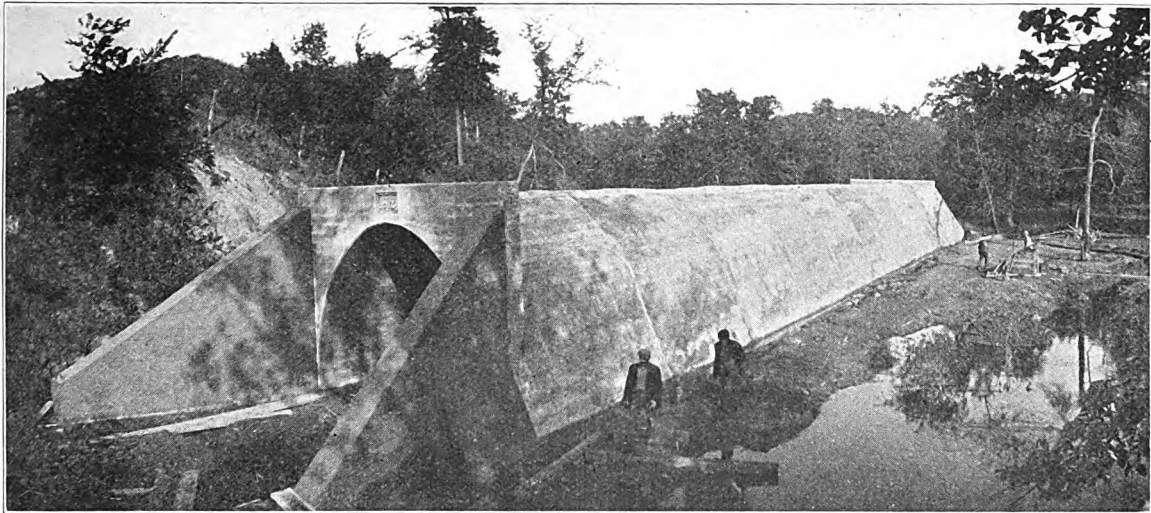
Reinforced Concrete 16x12½-ft. Arch Culvert ¼ Mile West of Madrid, Iowa.
